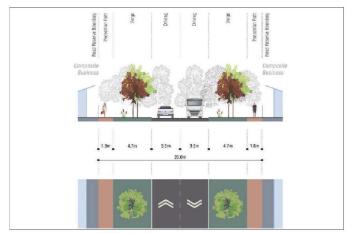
Road Cross Section - Sultana Road West (east of Brae Road)
